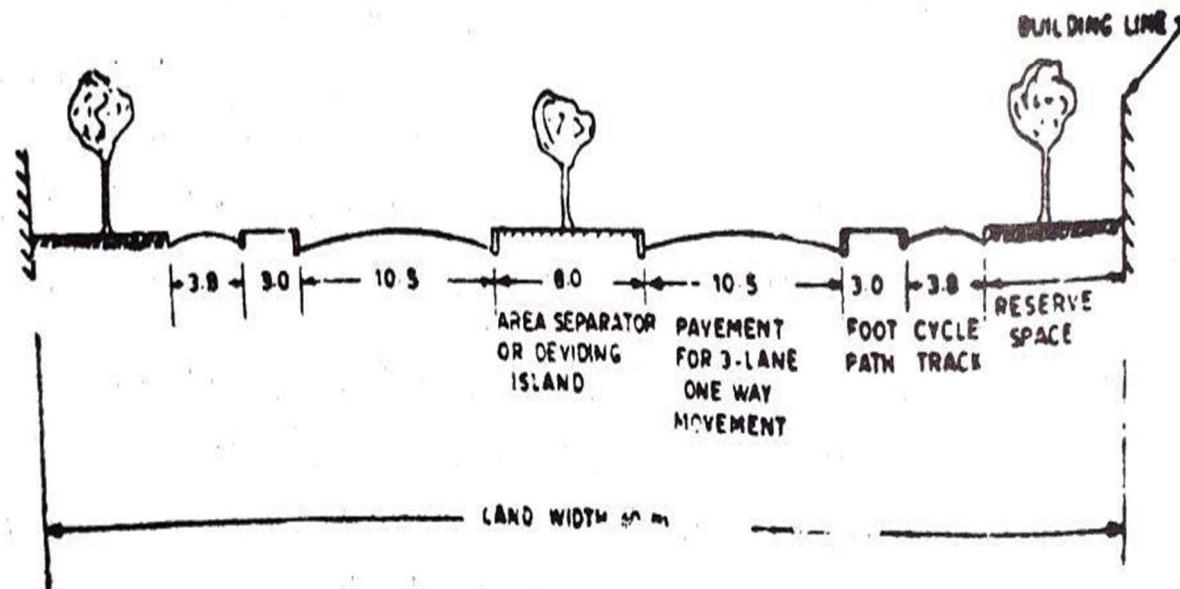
Cross Section of Divided Highway in Urban Area
